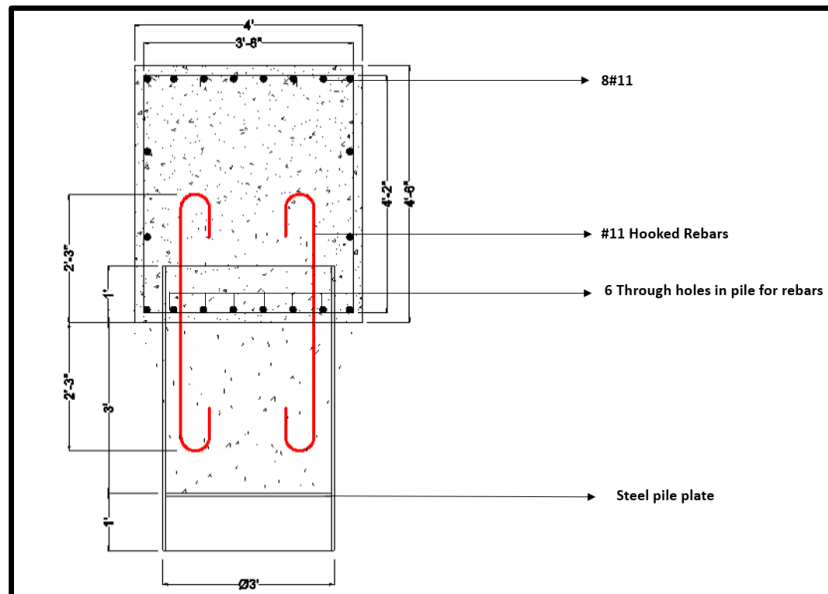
Typical Specimen With Non-Contact Lap Splice Connection; O2: Hooked rebar
